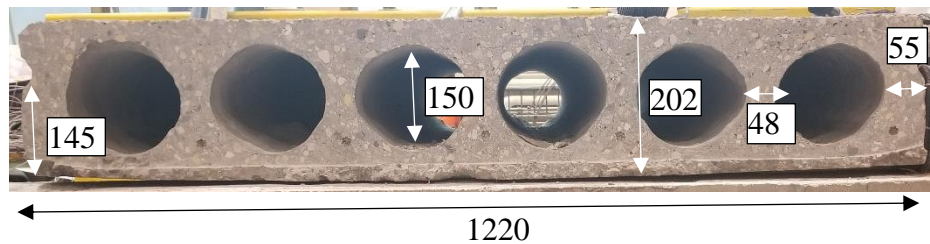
HCS Cross section. (all dimensions in mm)
